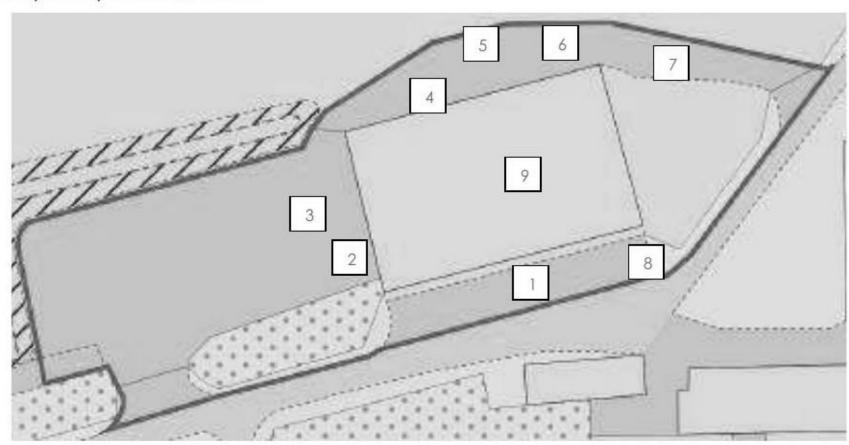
Numbered Site Layout Plan Corresponding with Photographic Record below
